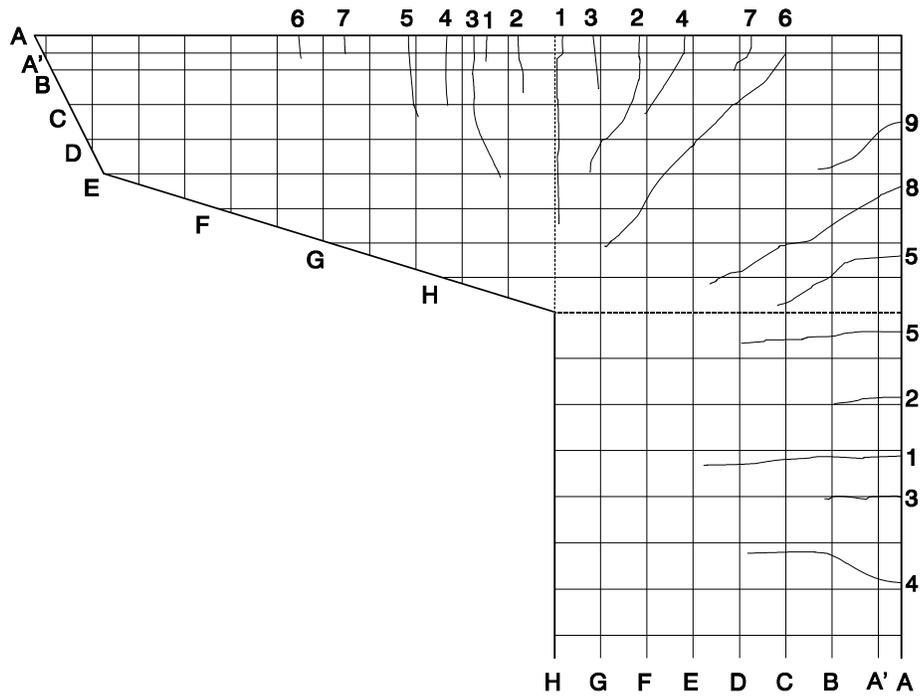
POJ-RC-100-TH cracking pattern on south face of specimen at dead load
